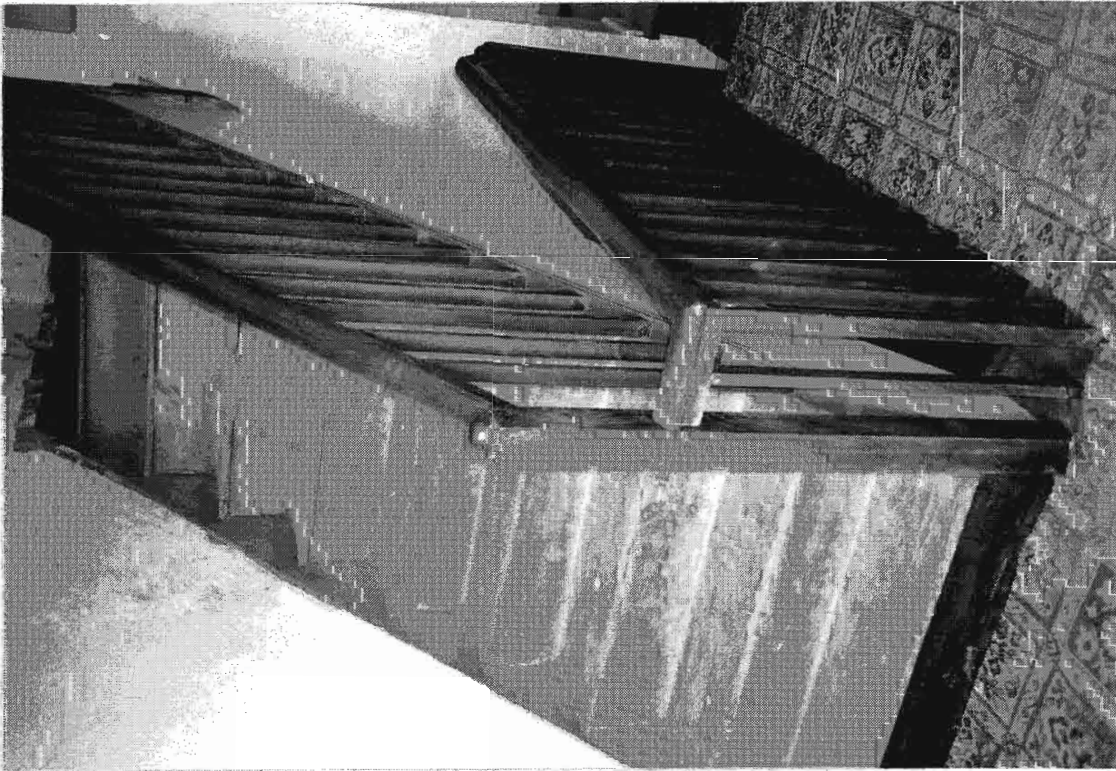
Detail of the main staircase in the farmhouse, at first floor level, showing the square newel with bun cap, stick balusters, plain oval, handrail and standard treads and risers, all of deal.
